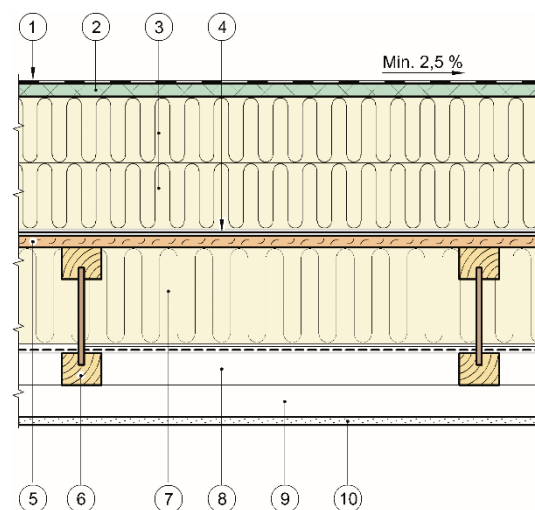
shows the principle design of roof elements. The load-bearing structure is based on rafters of I-beams or structural timber 300/350 +45 c/c 600 mm, alternatively on rafters made of glue laminated timber as indicated in Table 1.
